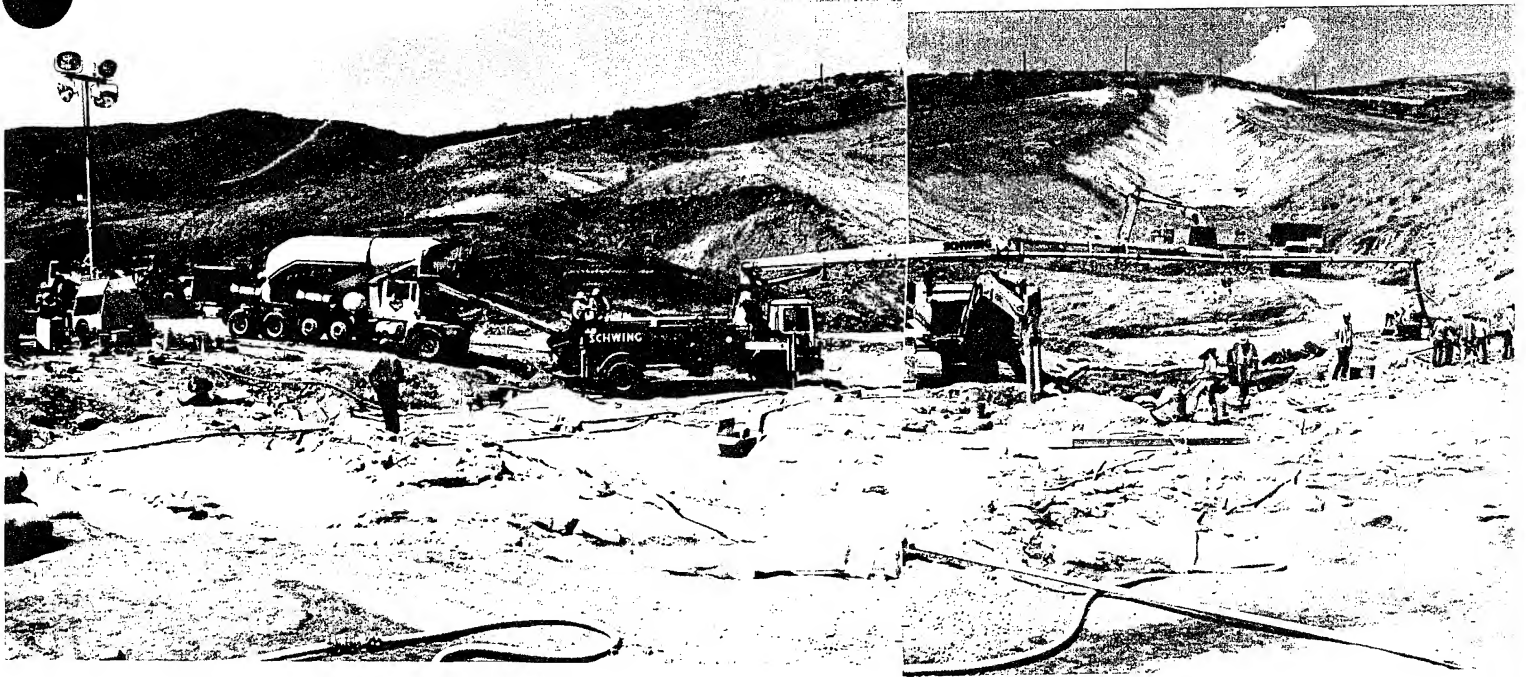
Concrete truck and concrete pump truck placing leveling concrete near Sta. 15+00, toe of upstream cutslope.
